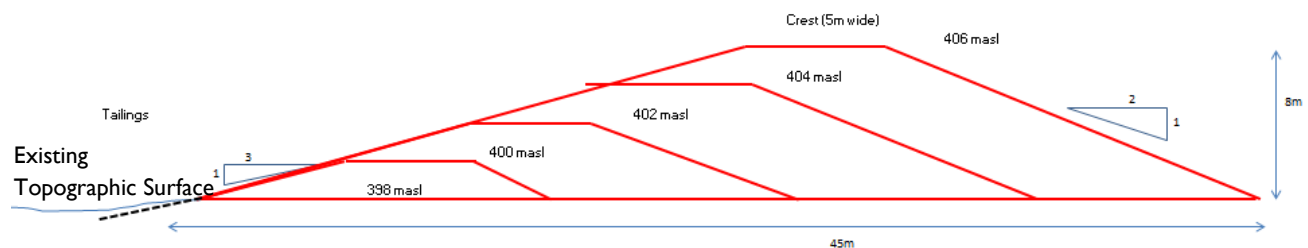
Typical Section Through Tailings Storage Facility Wall
